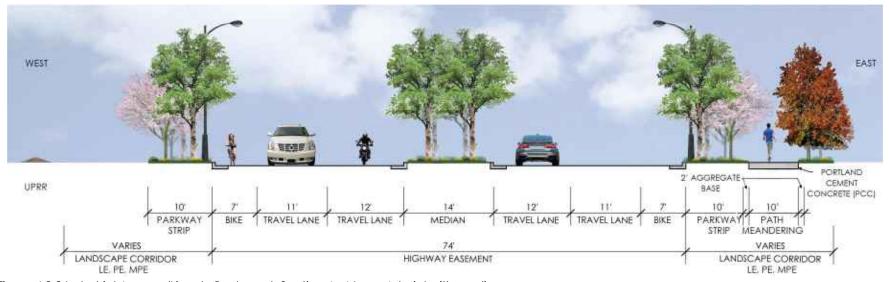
Industrial Avenue/Lincoln Boulevard- Section A, 4-Lane Arterial with median LE = landscape easement, PE = pedestrian easement, MPE = multi-purpose easement
